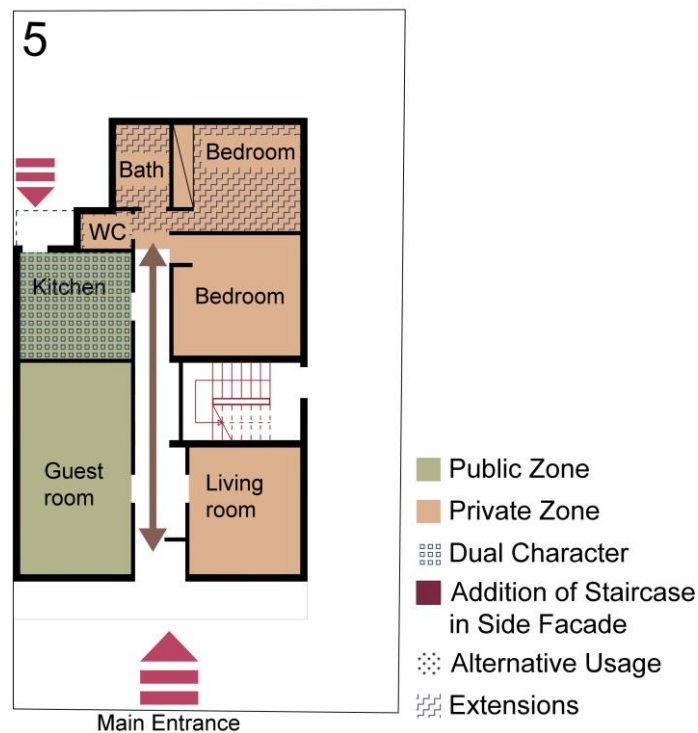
Ground floor sample for leading type I with side façade staircase (Author, 2017)
